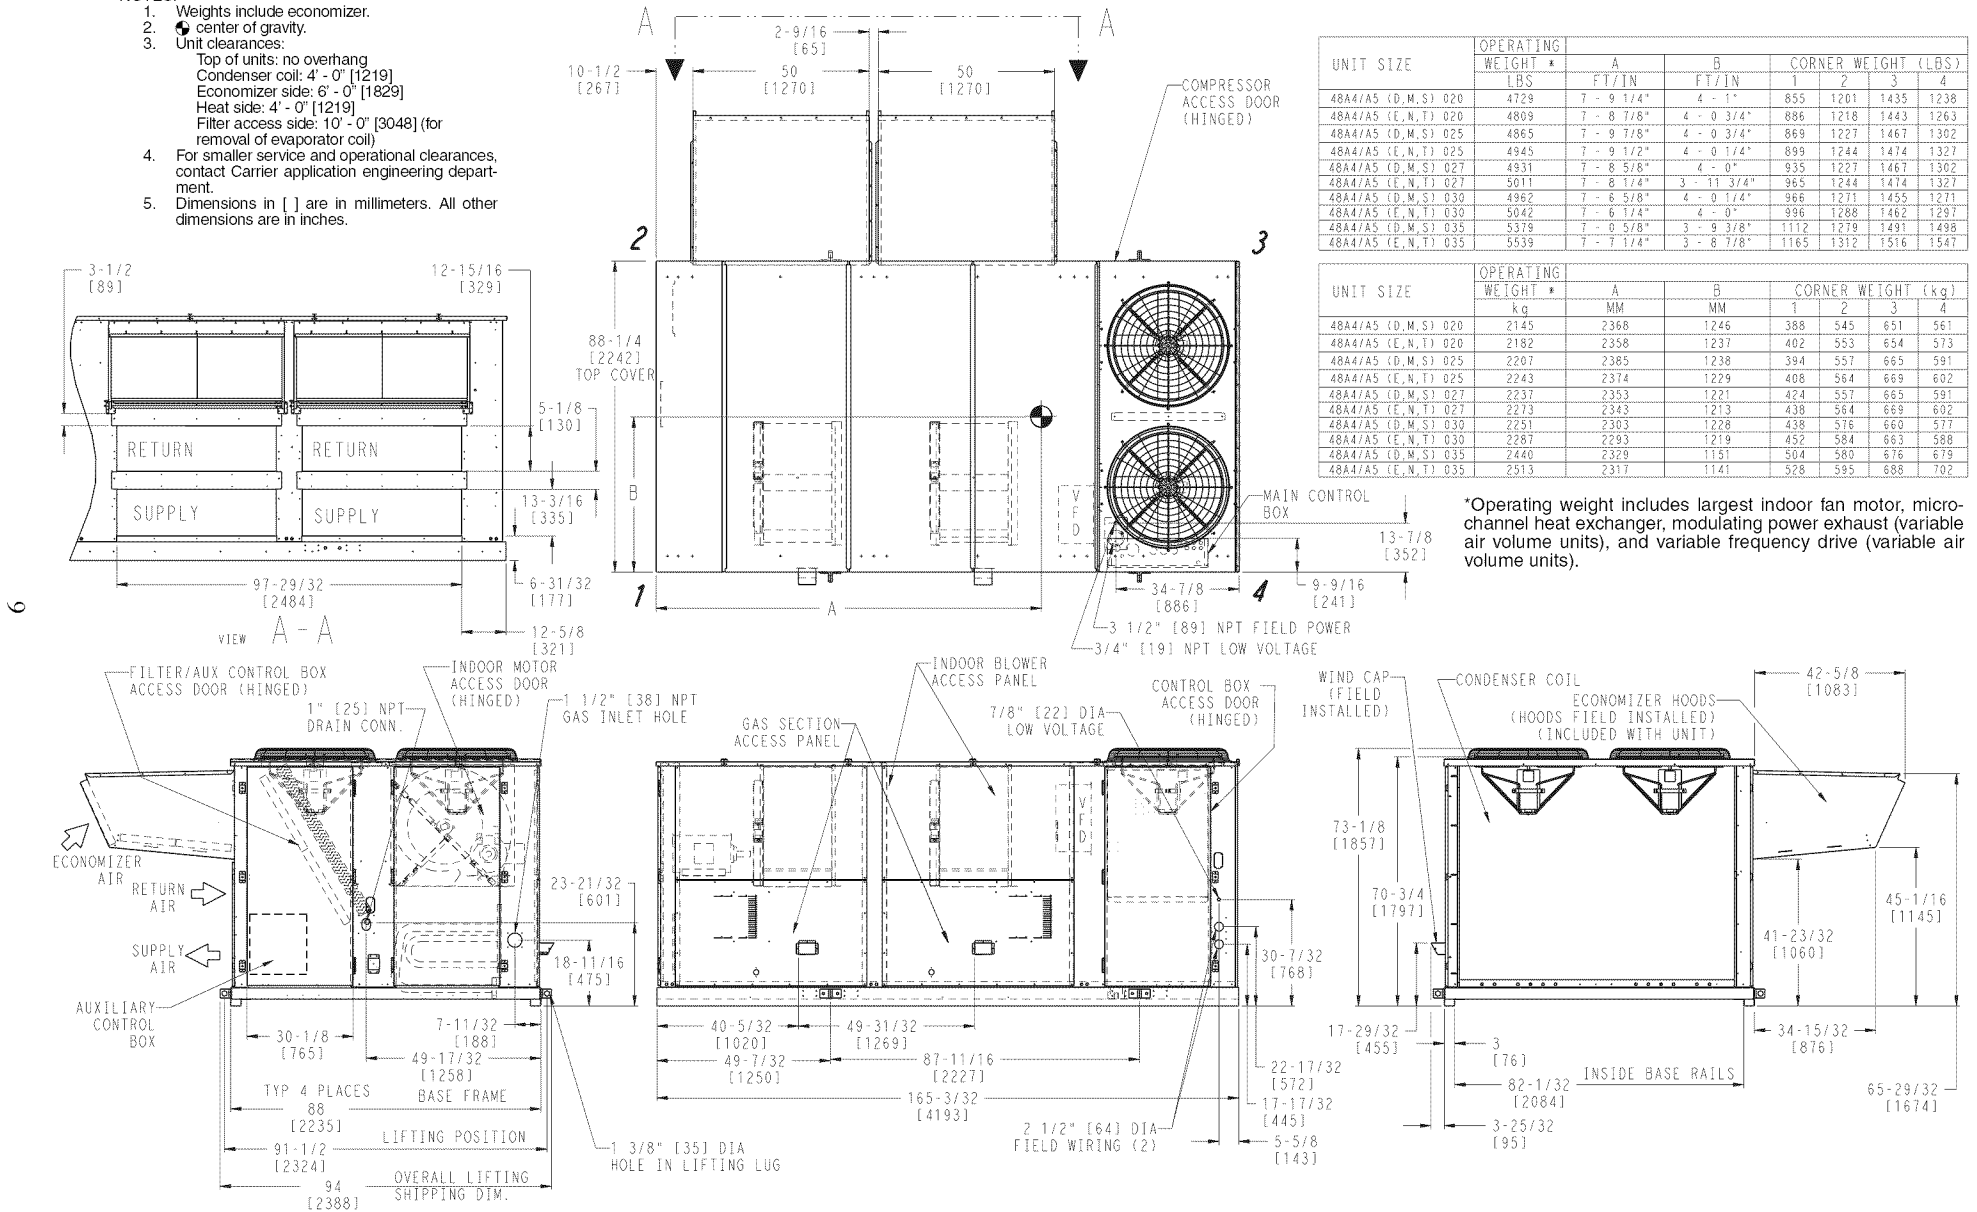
Base Unit Dimensions — 48A2,A3060
